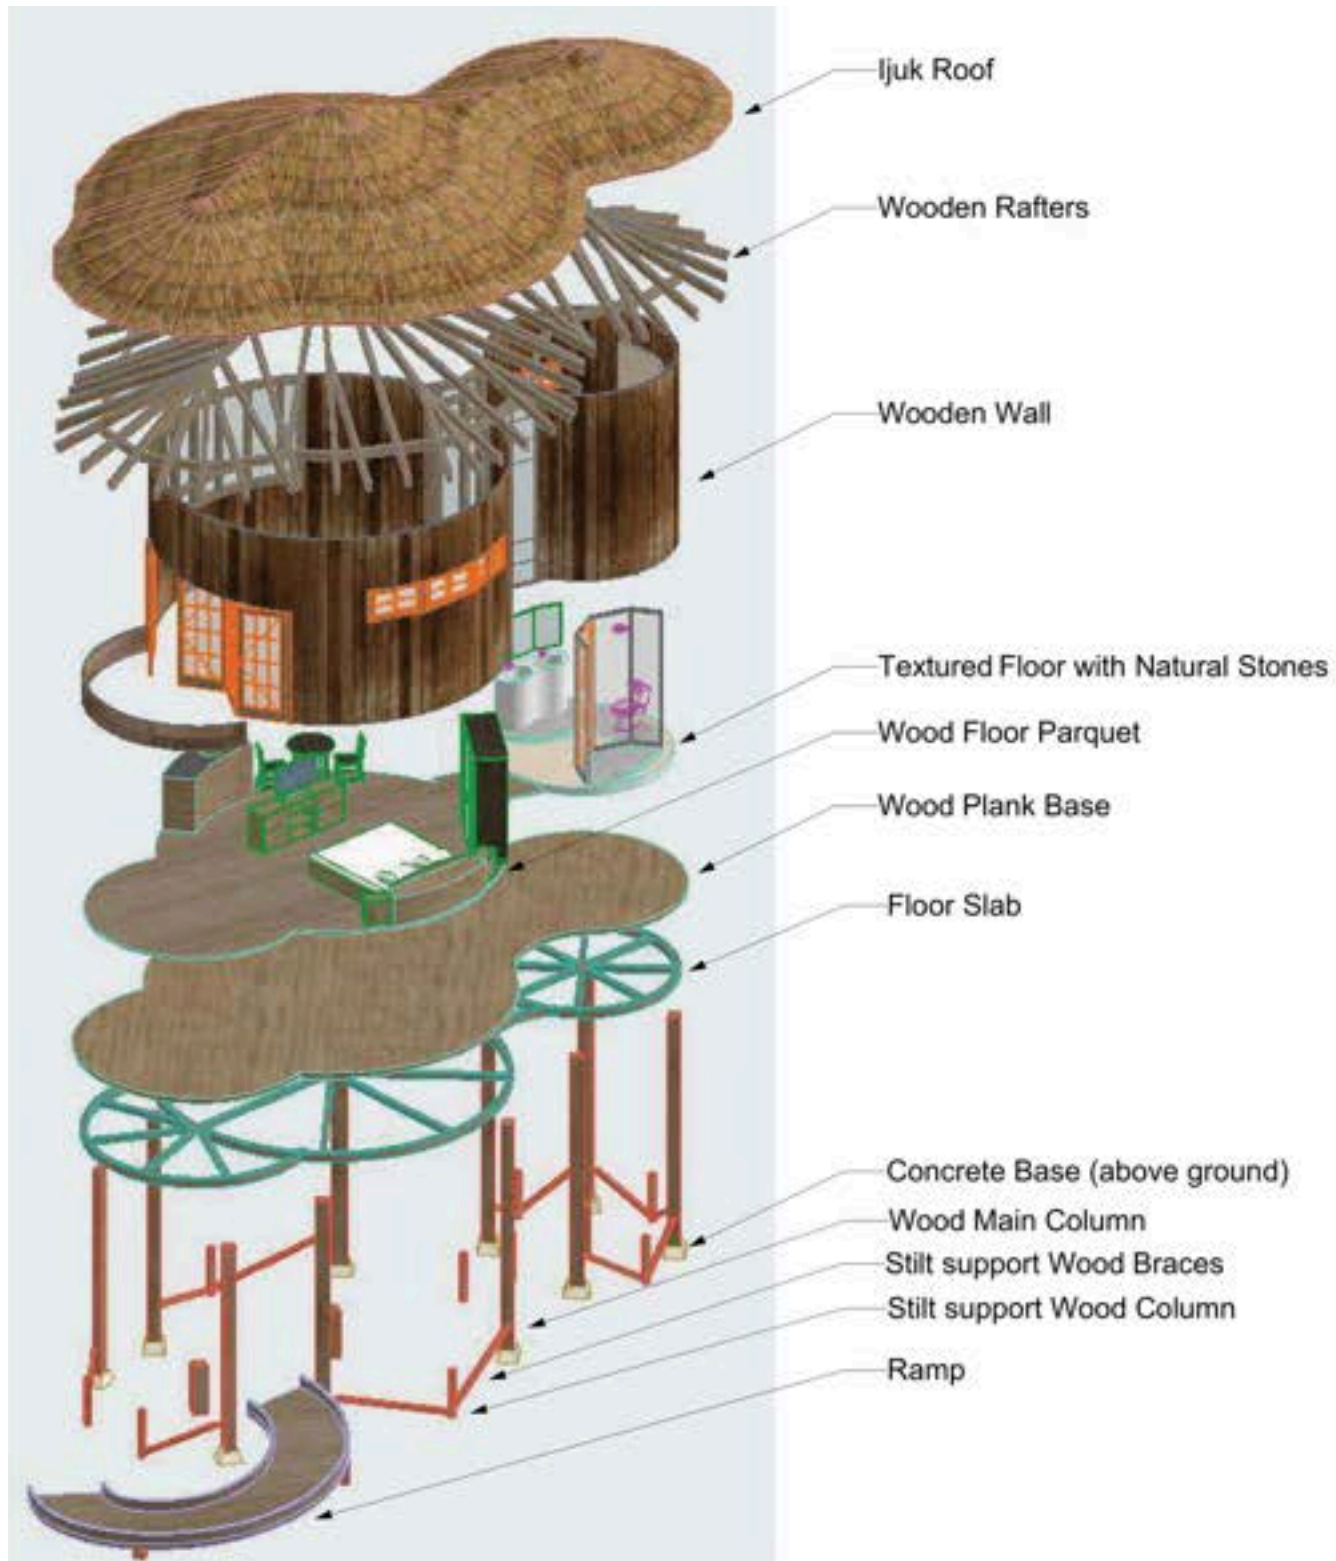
Unrevised Tentrem Guest Room Exploded Axonometric
